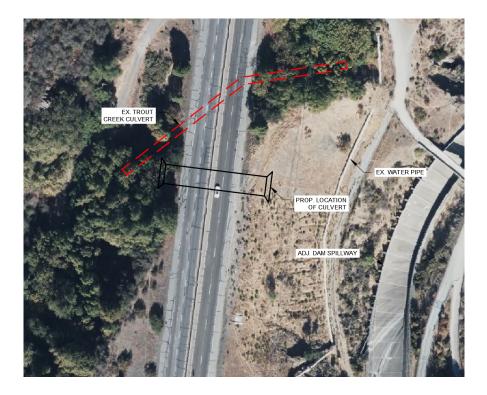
Location of culvert in relation to neighboring utilities and facilities.
